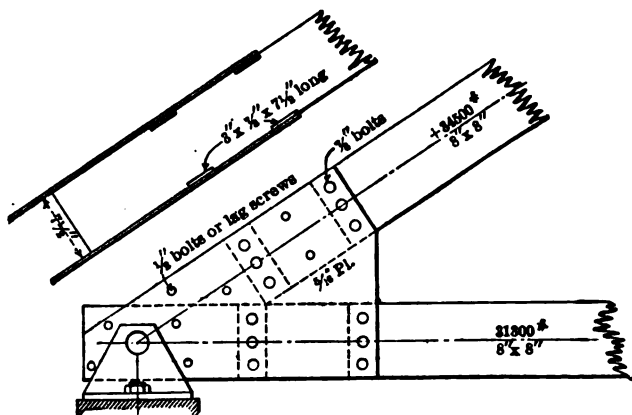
Detail of Joint 1, of Truss Similar to Fig. 1
